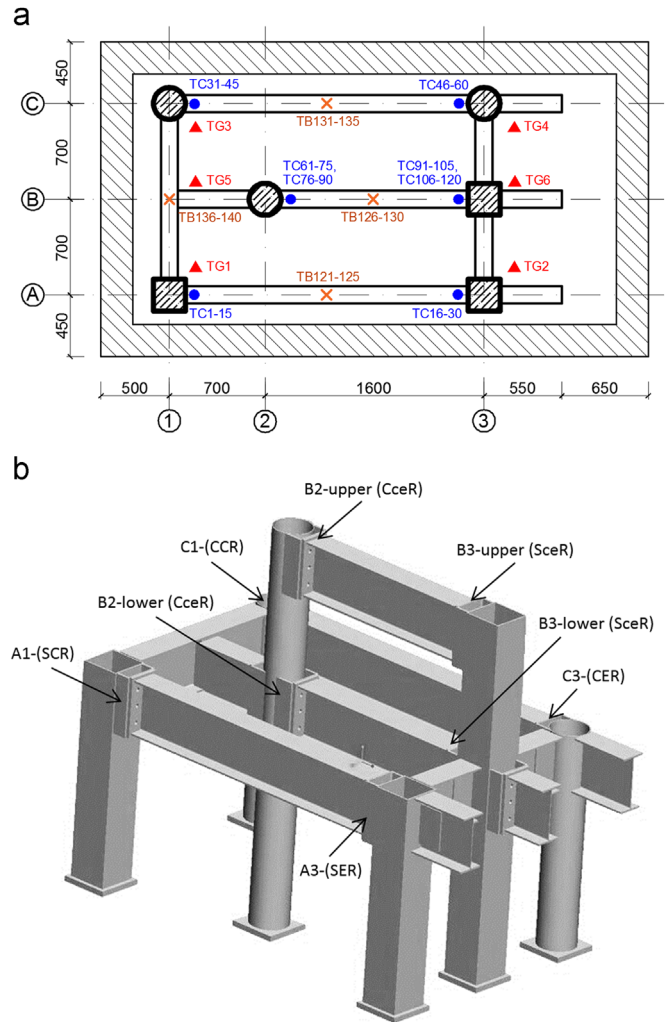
University of Manchester furnace fire test: (a) furnace ground plan; (b) axonometric view of a test specimen with connection notations.
